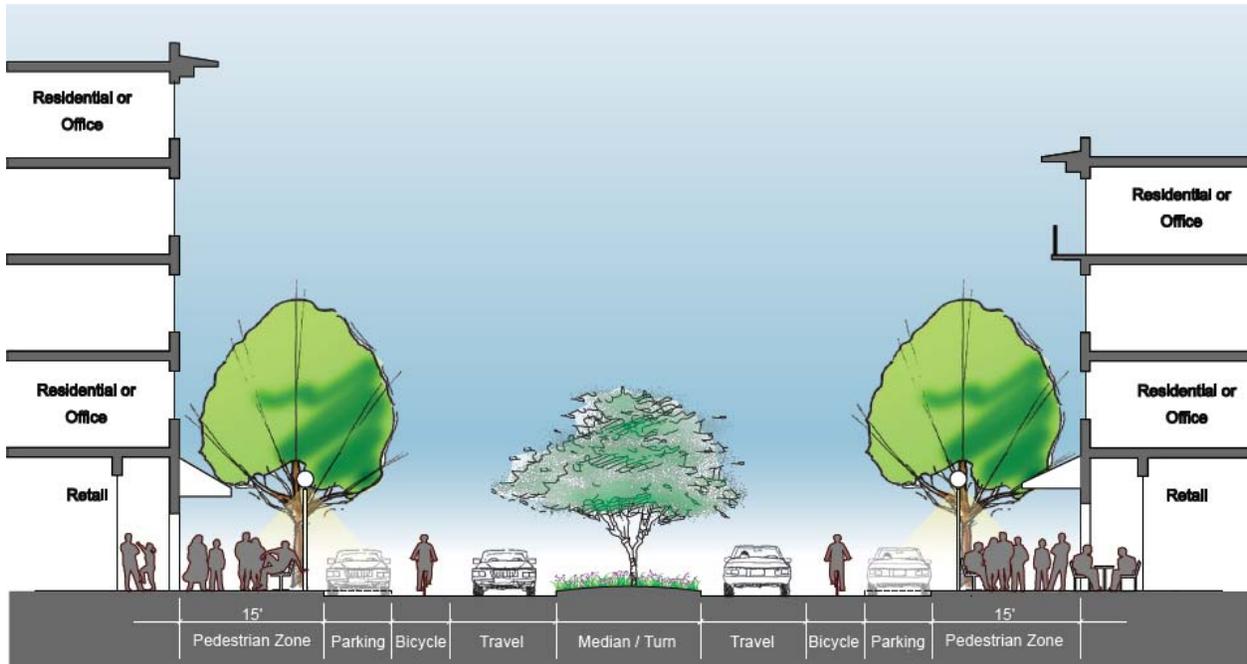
Folsom Boulevard between 59th Street and 62nd Street
